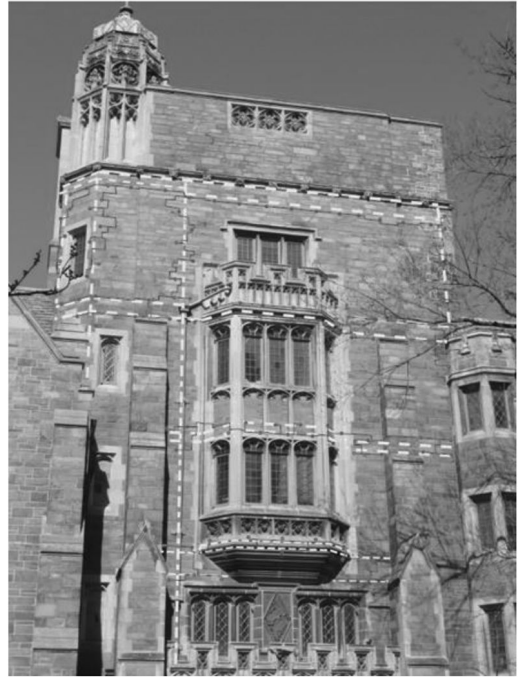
Anode Layout, Zone 2. College Street Elevation.
